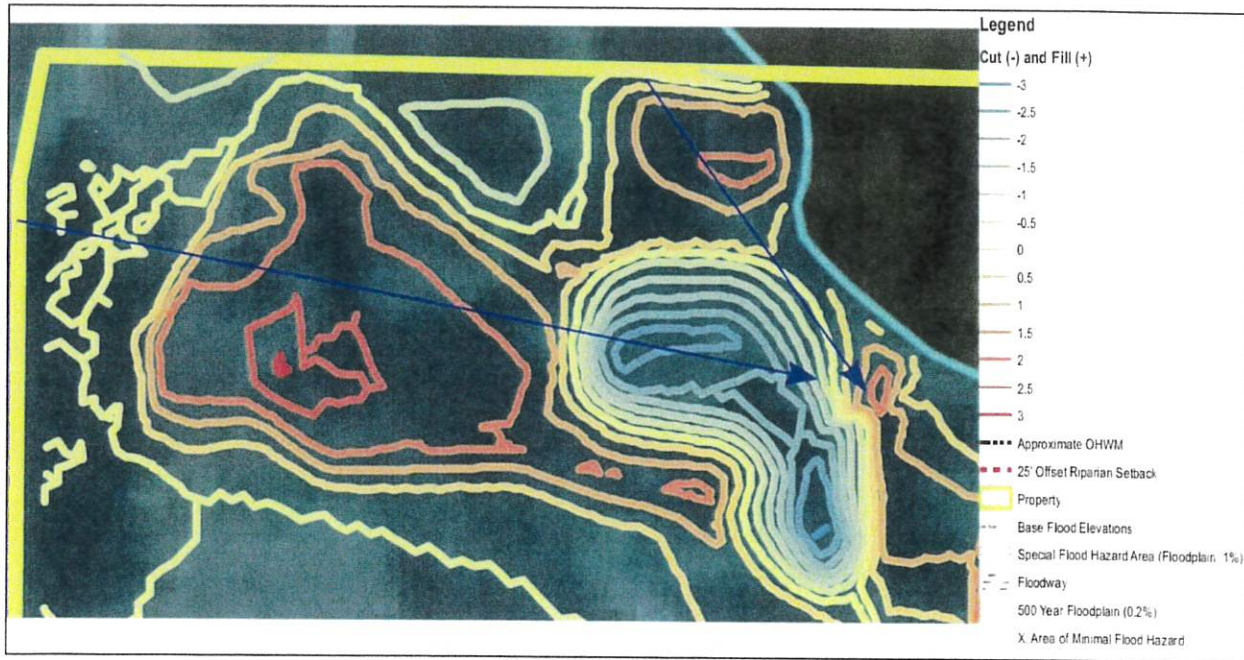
Proposed grading cut and fill quantities showing up to 3 feet of fill to be placed blocking natural drainage patterns (highlighted with blue arrows). Source: Brockway Engineering, PLLC.
